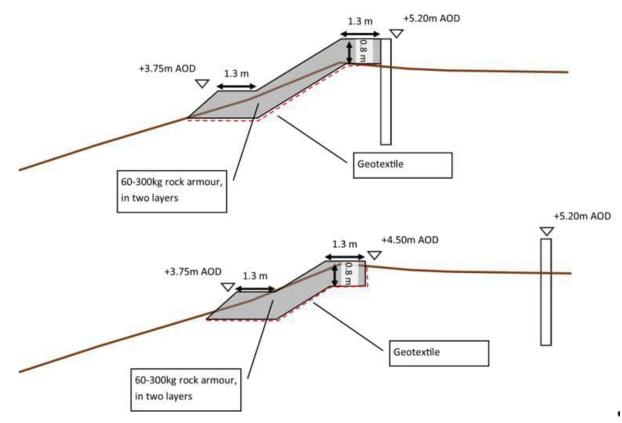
Typical cross-section bare steel sheet piled wall with scour protection – depending on local constraints the scour protection revetment may be directly adjacent to the piled wall or set back.
